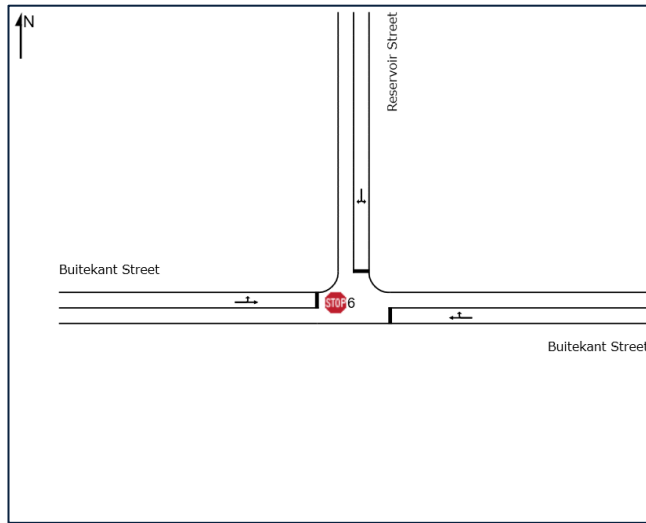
Buitekant Street and Reservoir Street: Existing Layout
